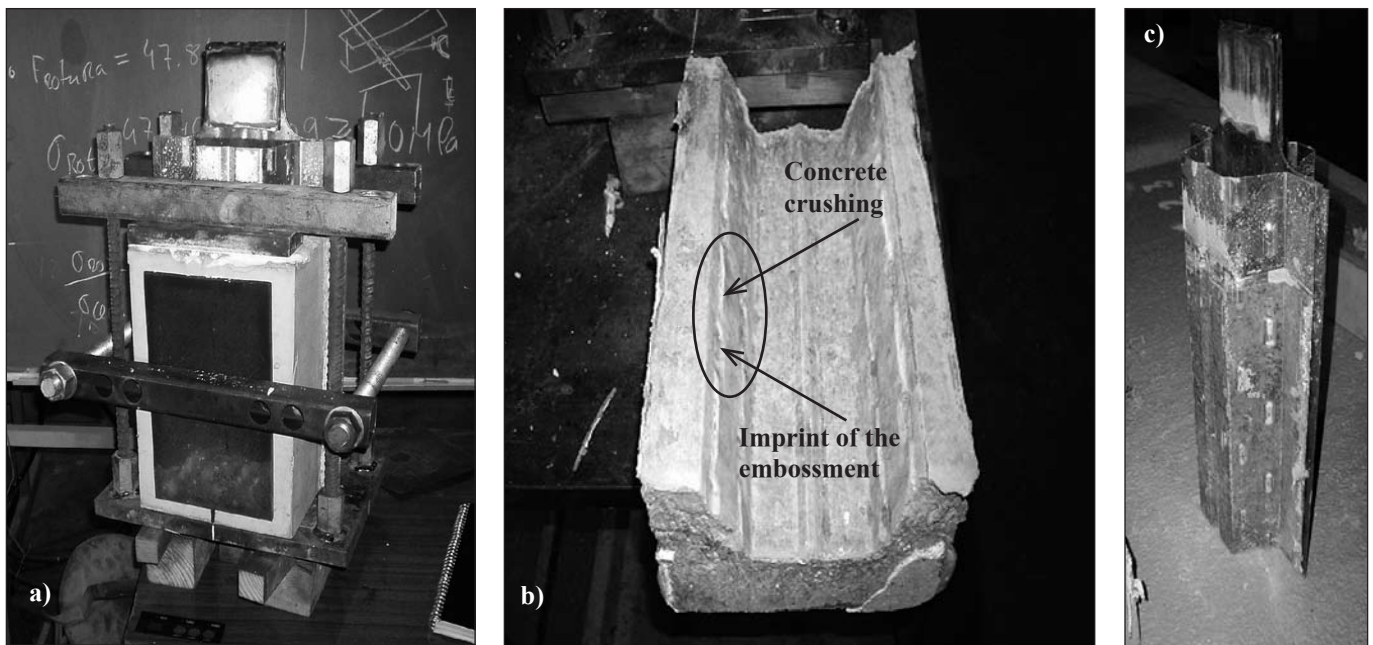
Pull-out test of Freire (2009) (a) test specimen (b) concrete part and (c) steel part after the failure of the specimen
